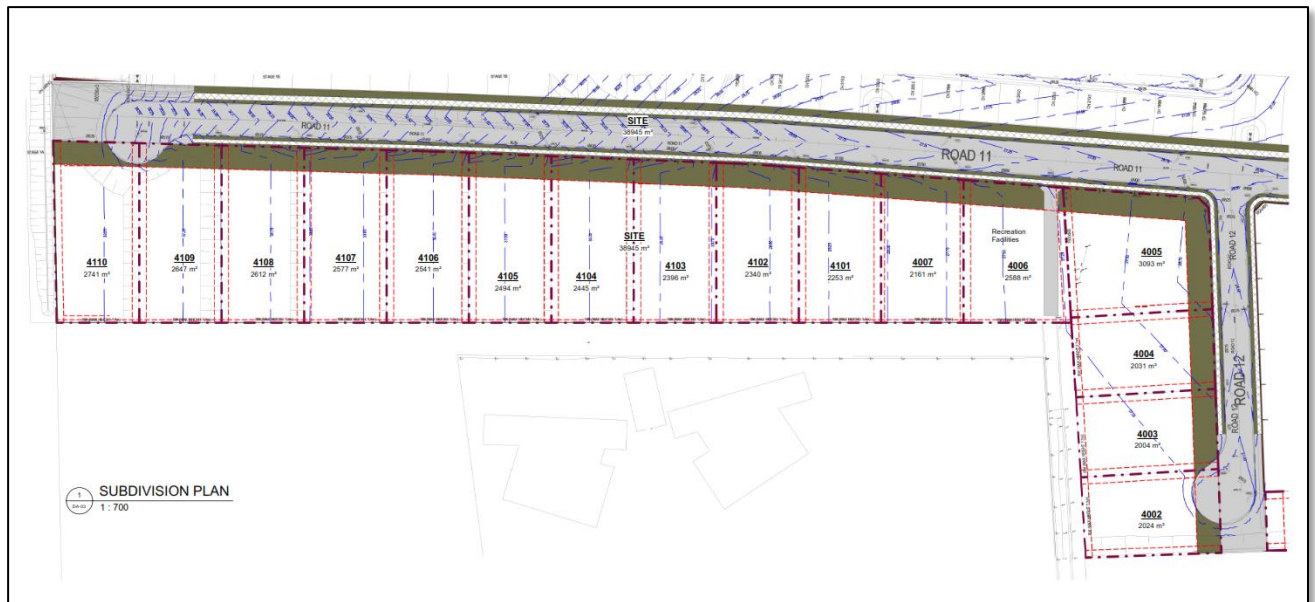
Approved Subdivision Layout Plan (Source: Extracted from Architectural Drawings)
